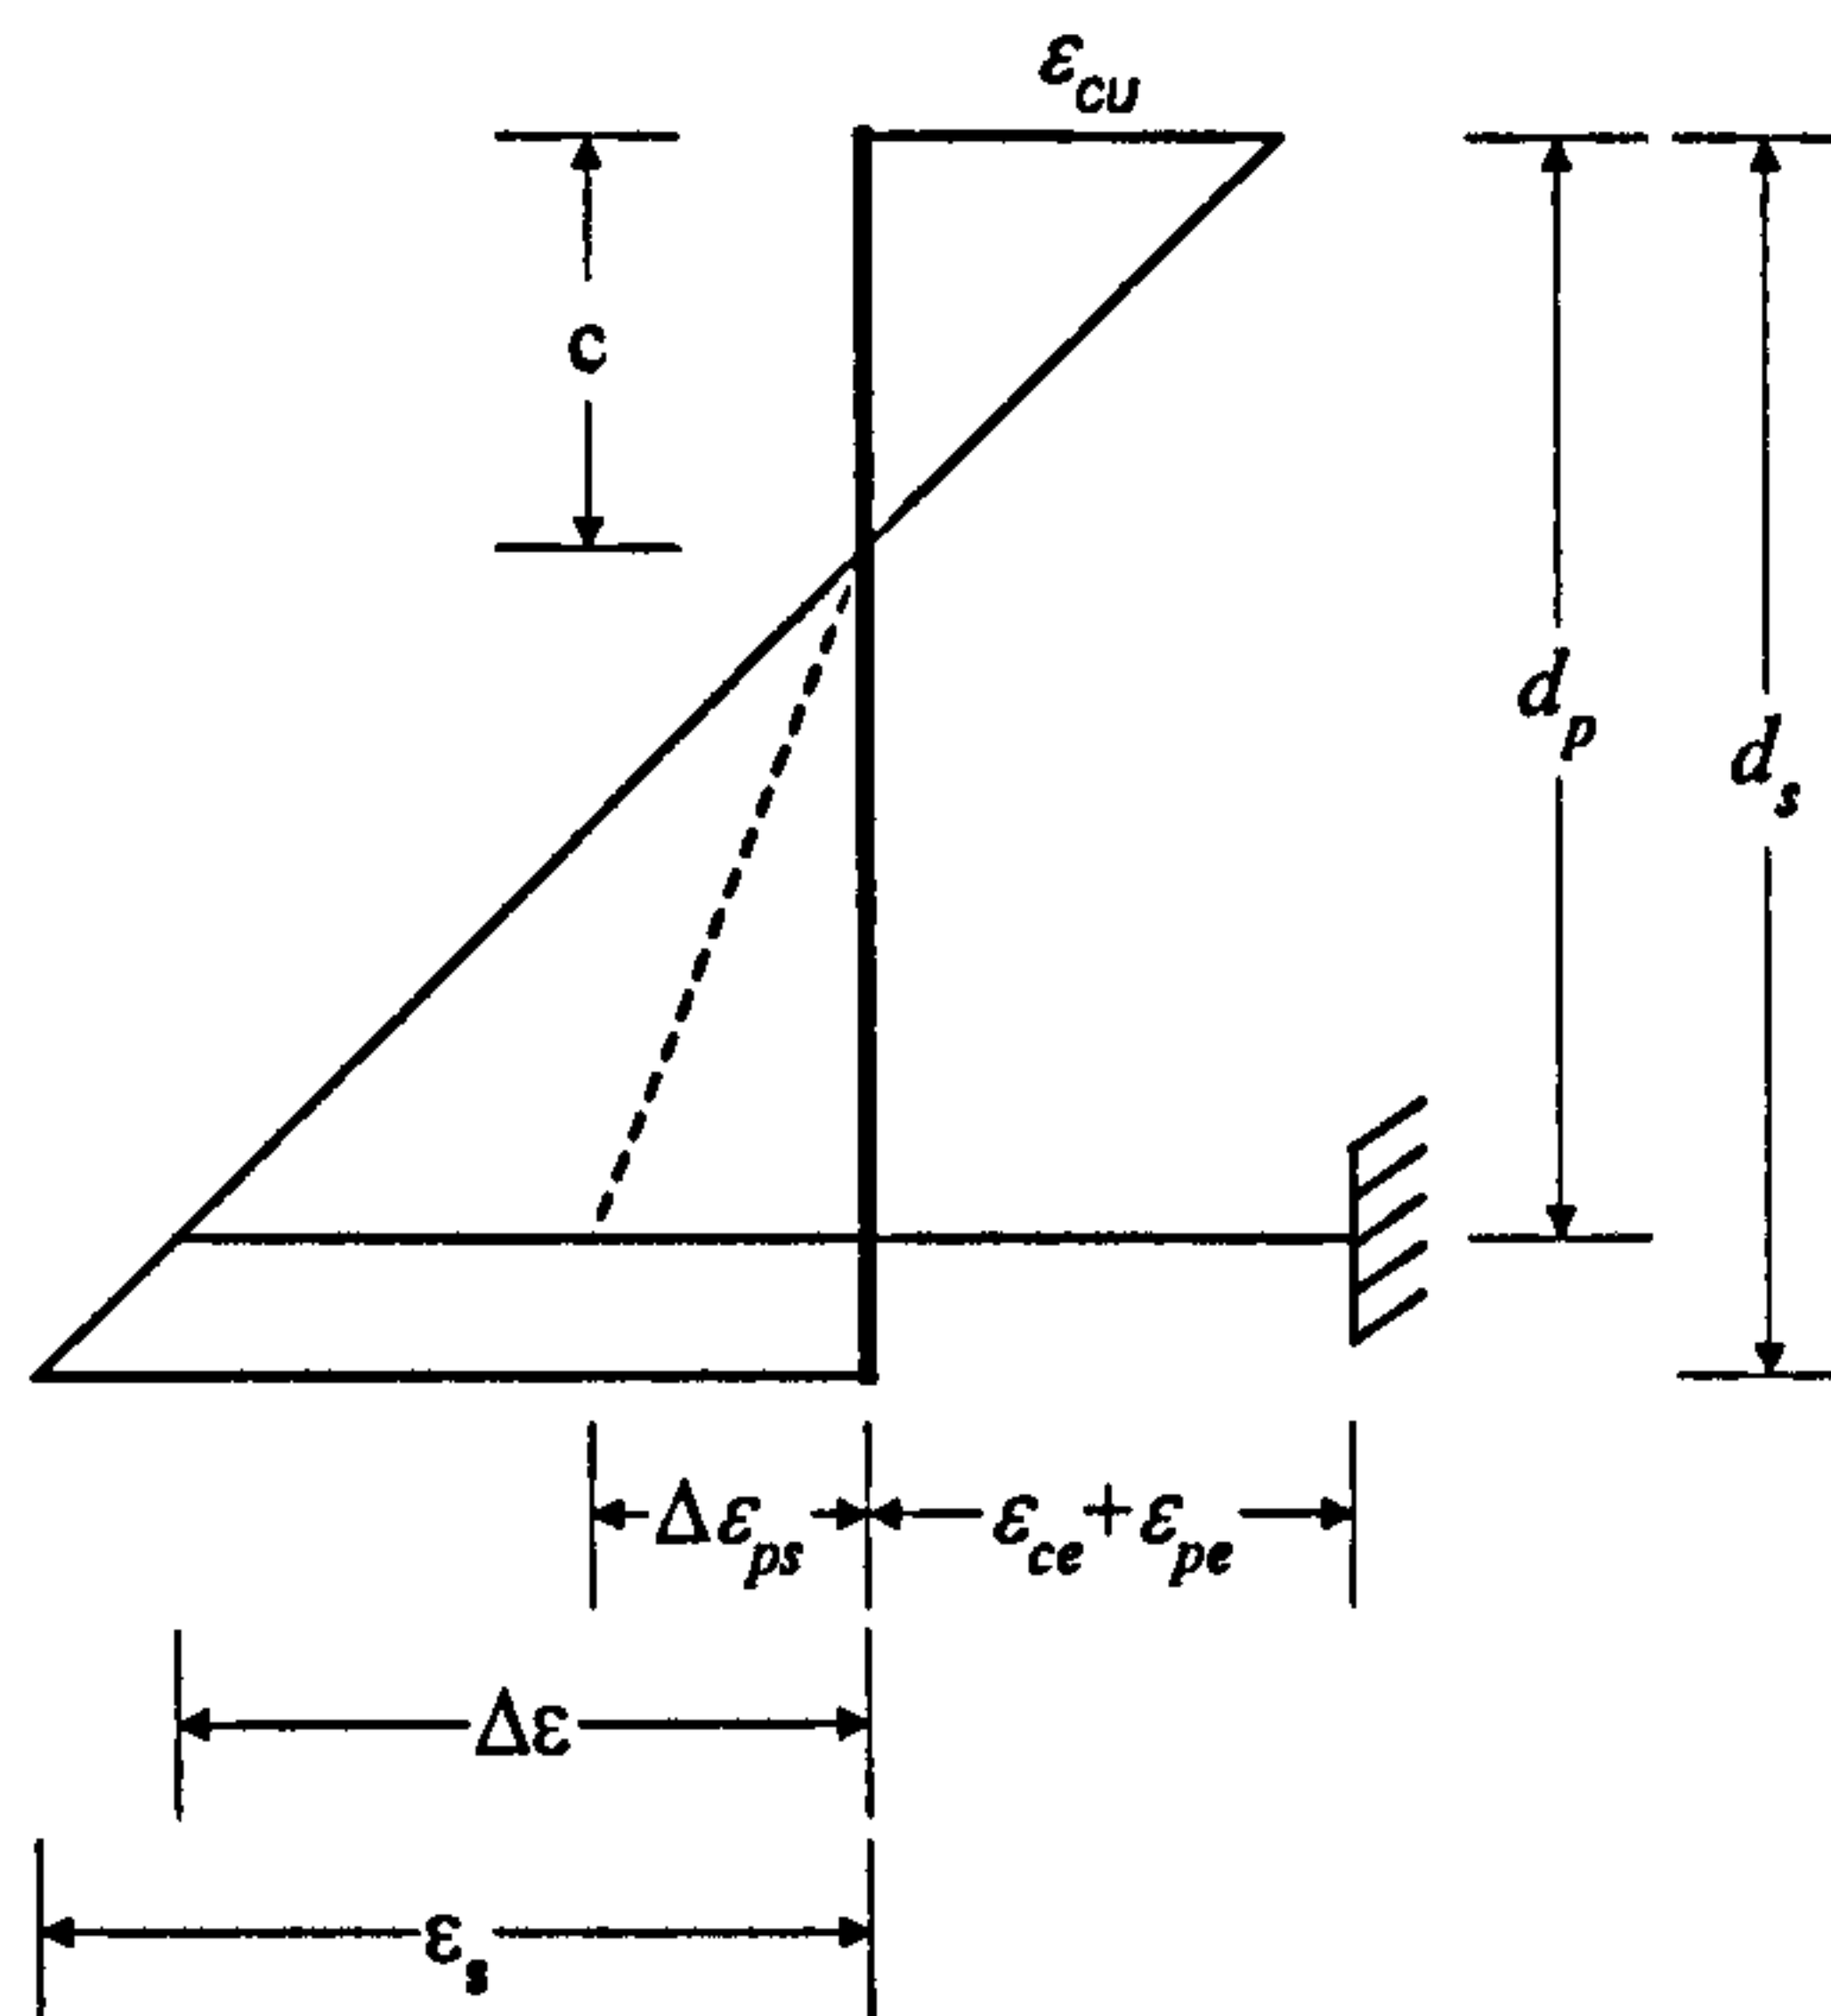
Strain distribution across the depth of unbonded prestressed concrete beam section
